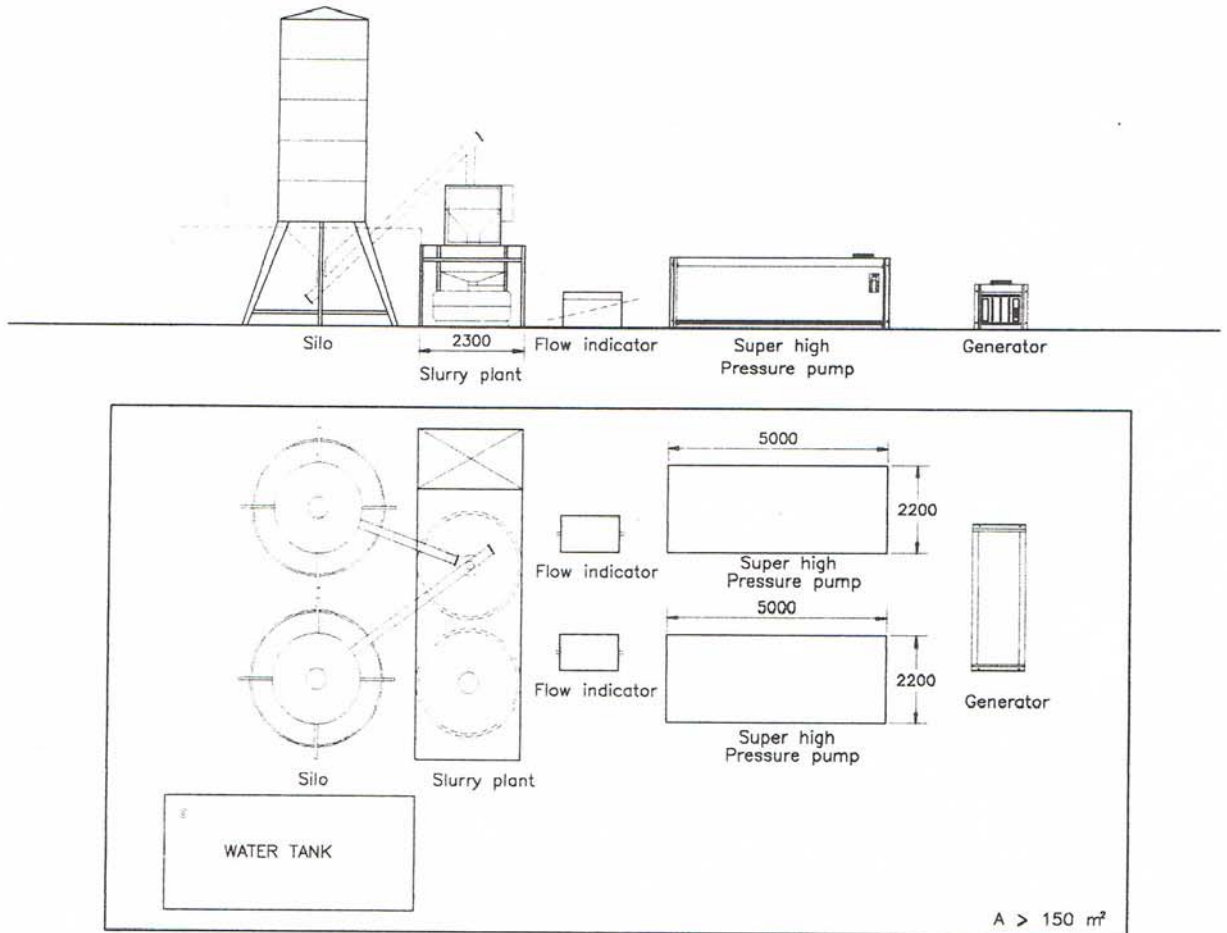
Arrangement of slurry plant using 2 machines
